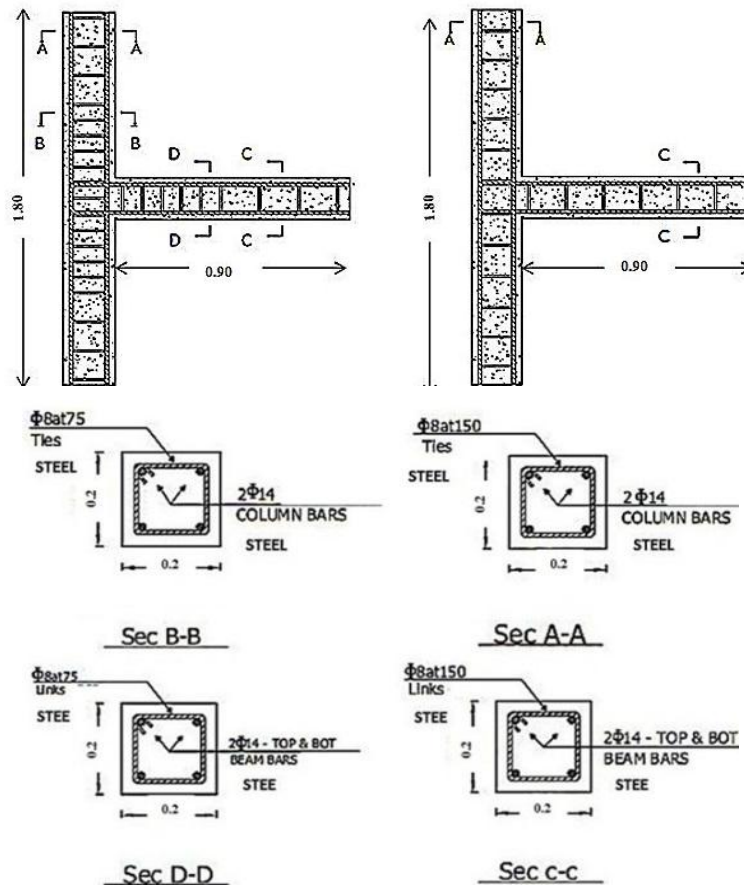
Specimens reinforced and sections with steel bars at exterior joints for specimens (m)
